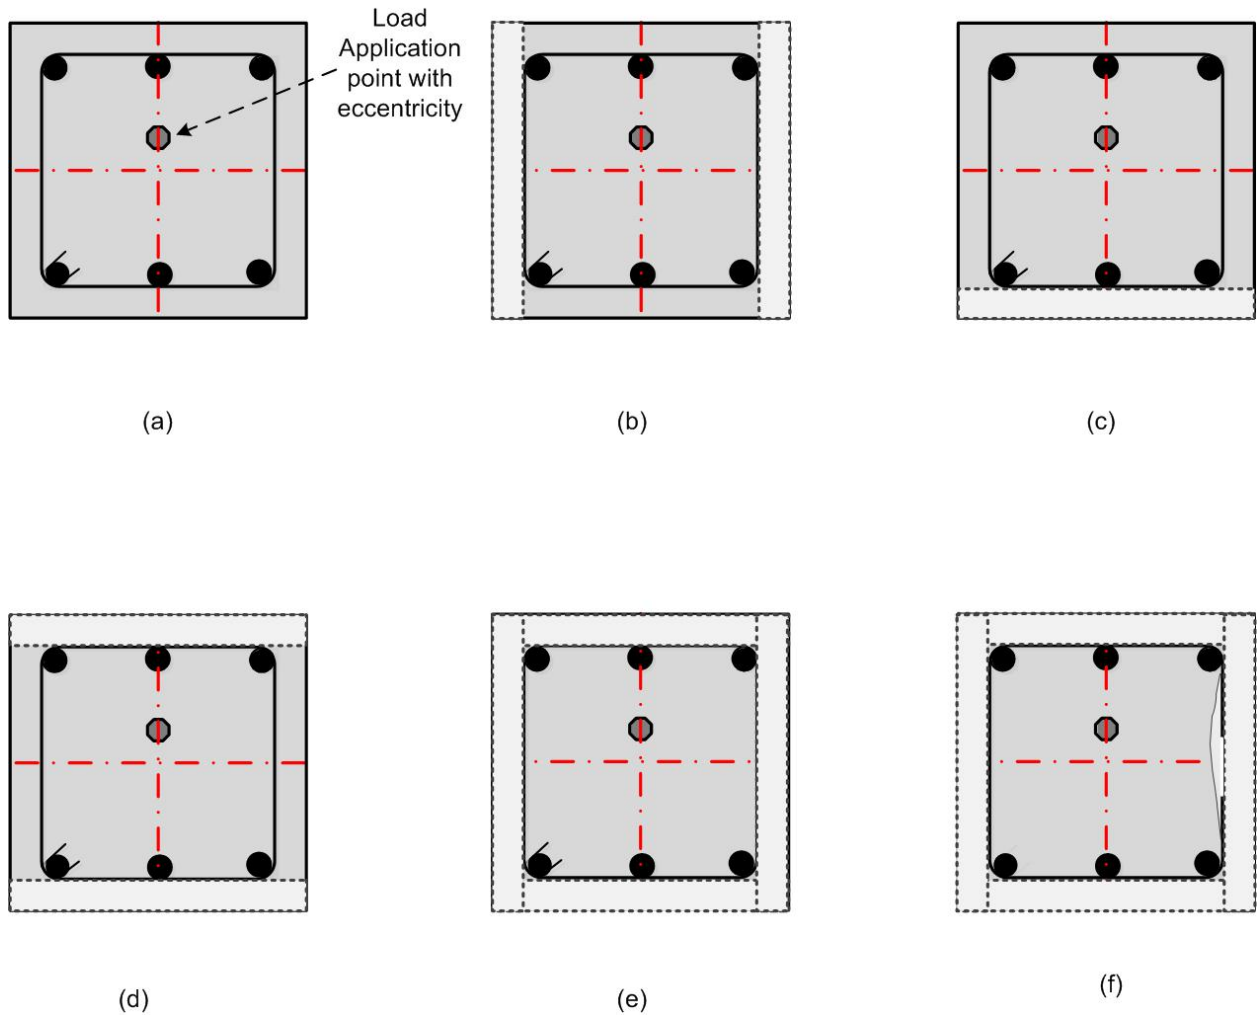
Possible damage in an RC column section due to corrosion (case study 2.6.4).
